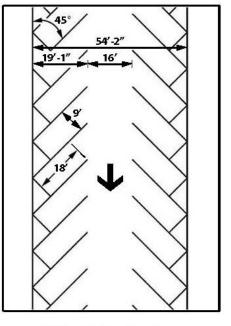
Minimum Dimensions for Common Parking Lot Layouts
